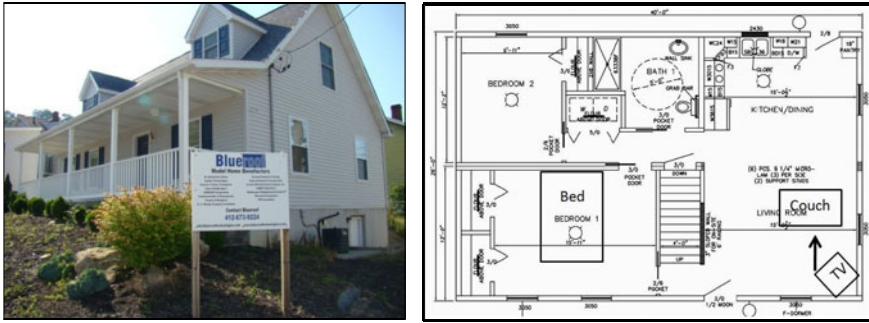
Floor plan of Blueroof House located at suburban area of Pittsburgh, PA
